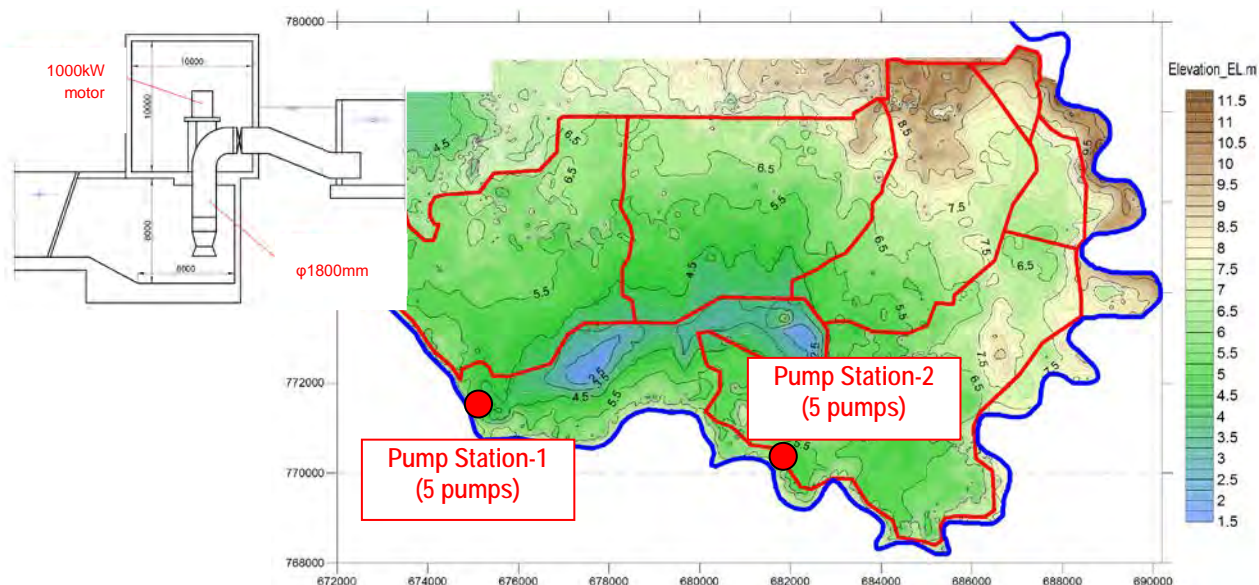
A Preliminary Example of Drainage Pump Stations and Typical Cross Section
